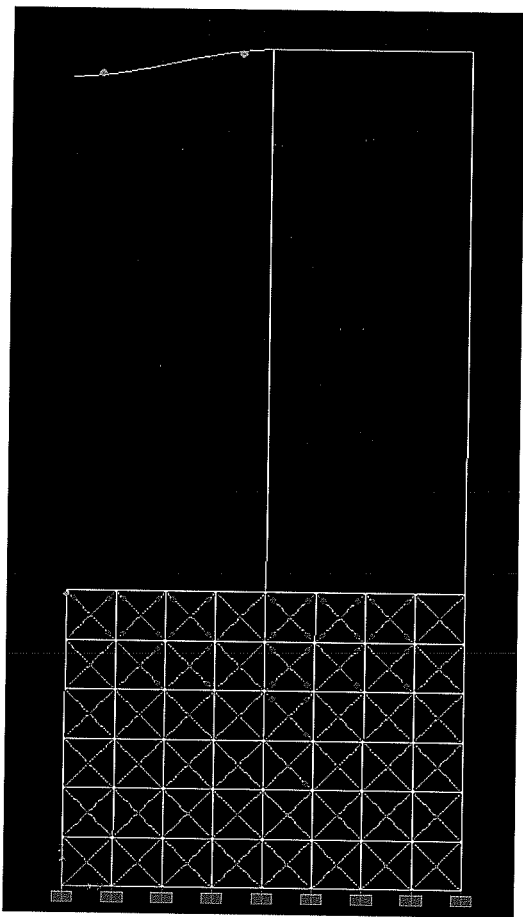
SH-87 Bridge Column Removal Analysis-1
